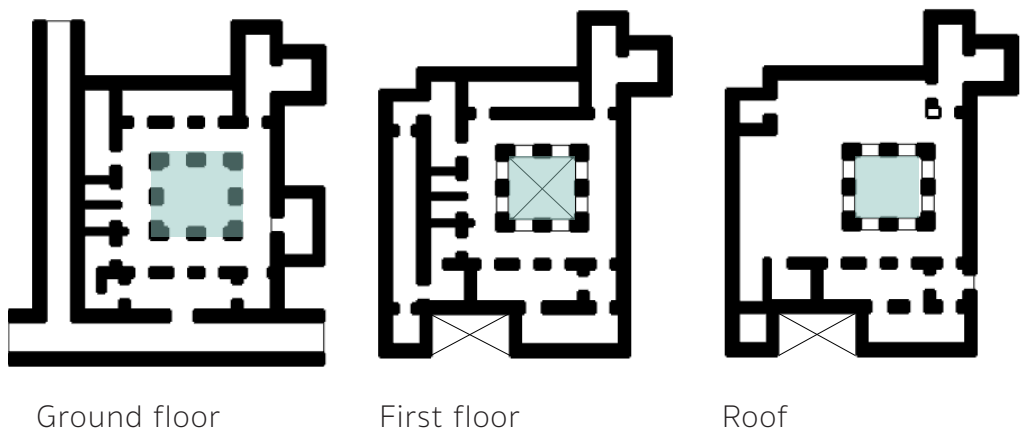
Figuur X. Schematic overview of how the buildings are constructed within the walls.
